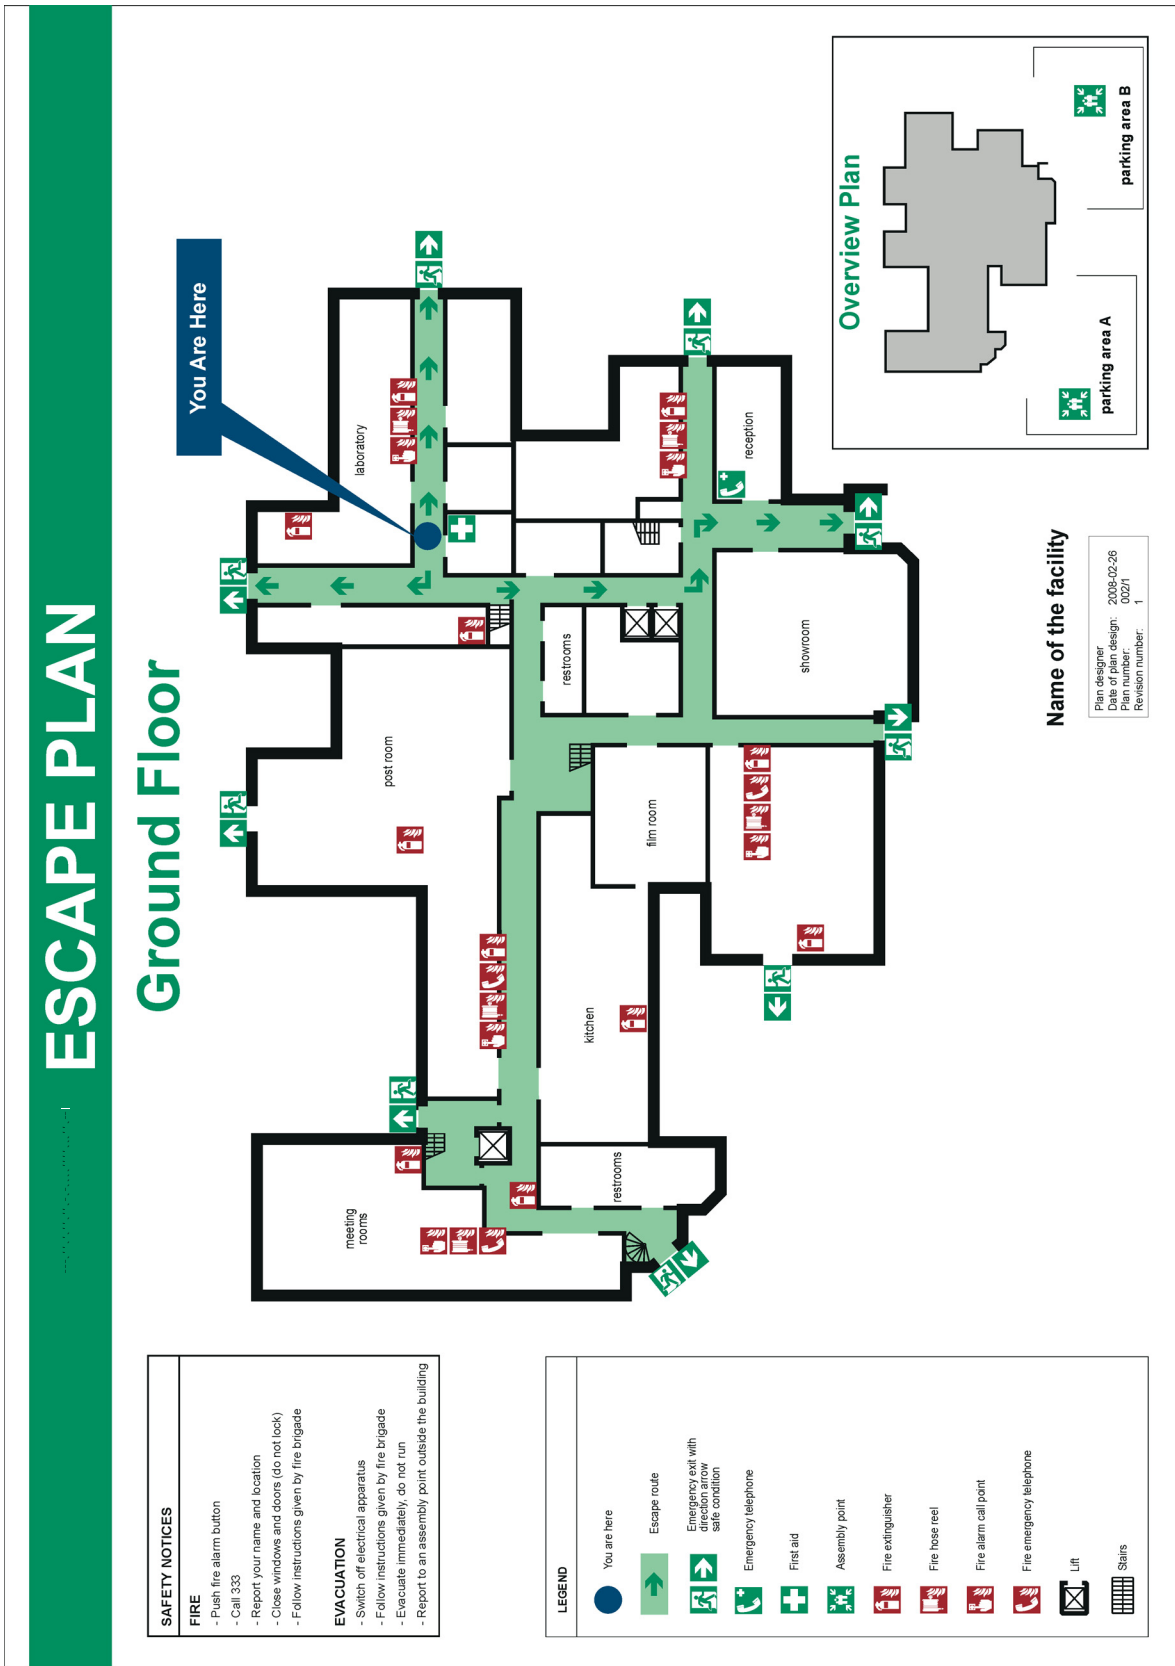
Example of an escape plan with directional arrows — Complete floor
